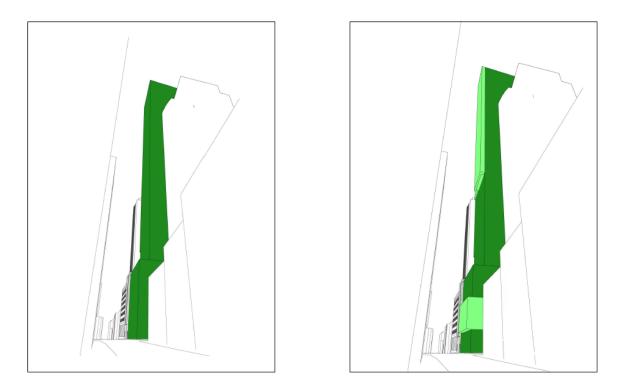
Impact of proposed changes when viewed from Pitt Street looking south (approved – left, proposed – right)
